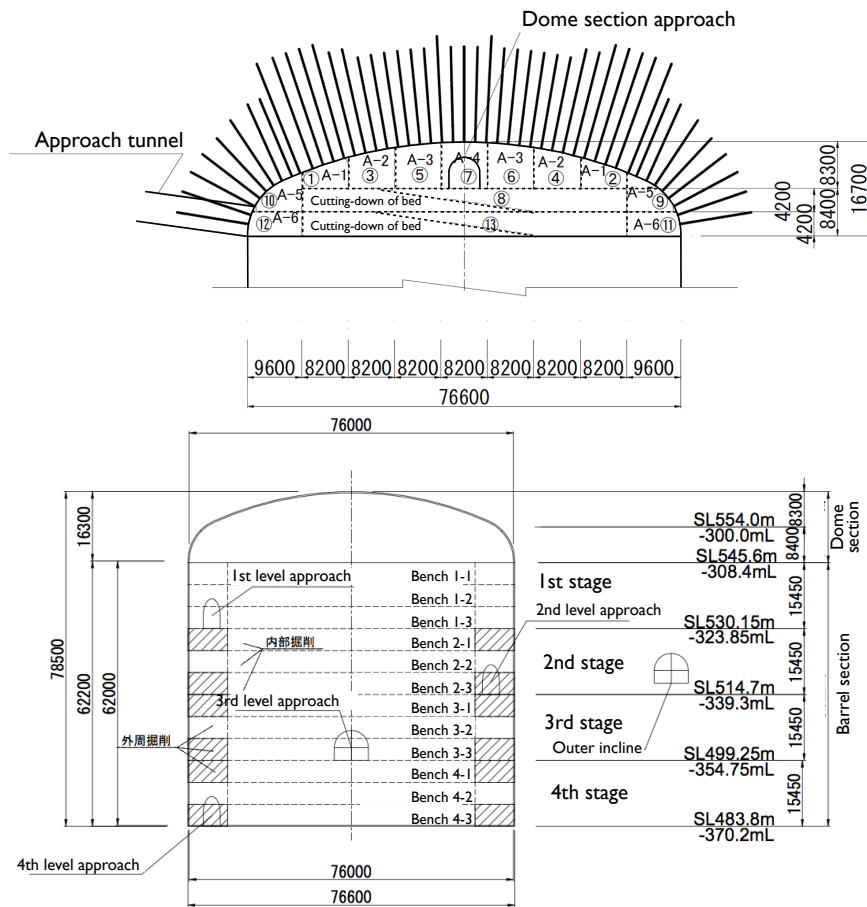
Illustration of the excavation steps for dome section (upper figure) and barrel section (lower figure).
